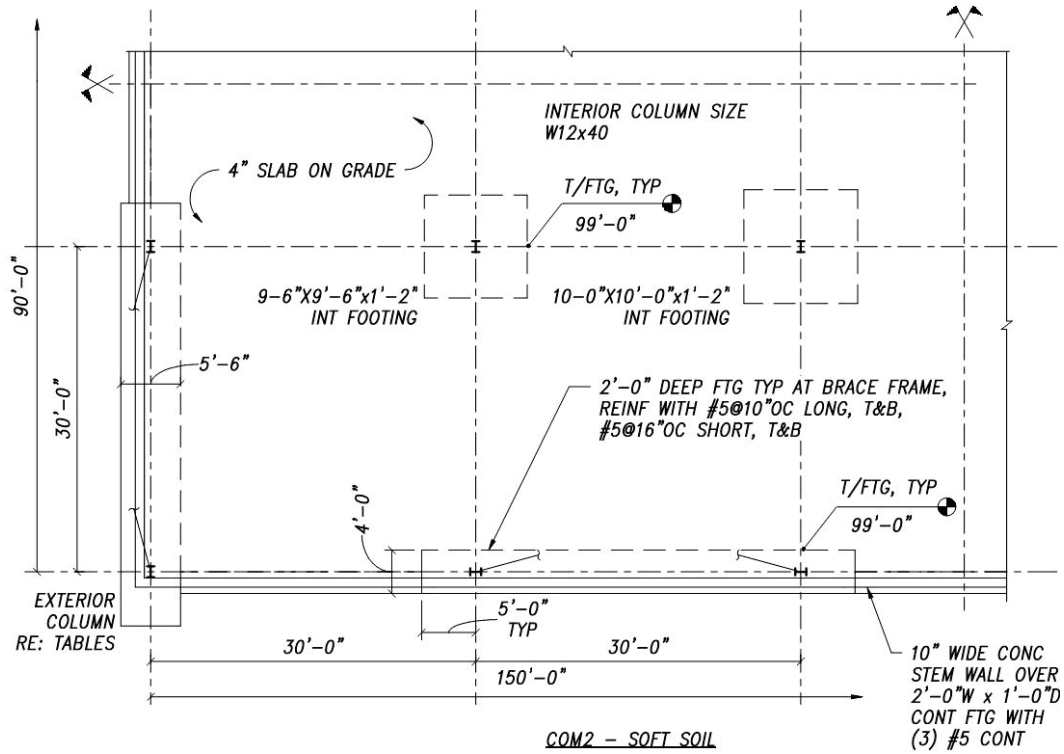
Foundation plan: COM2B-SS with soft soil.
